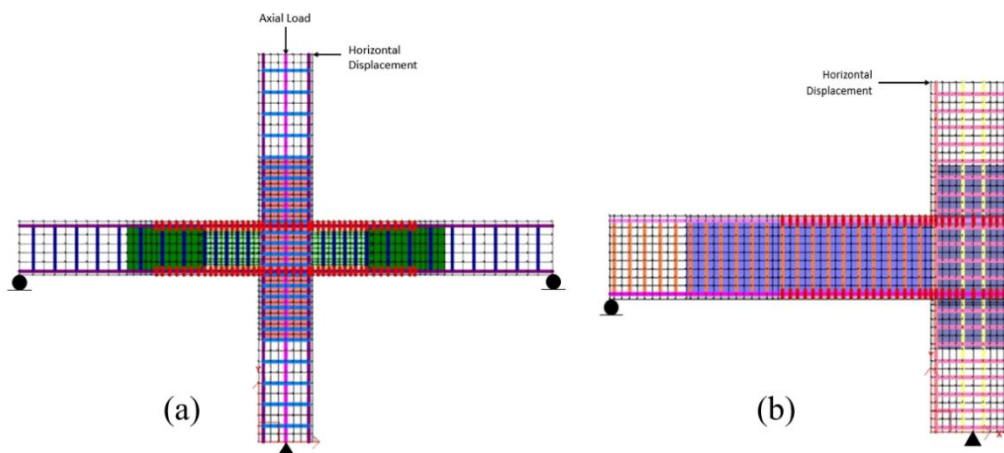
Typical VecTor2 modeling for (a) interior and (b) exterior beam-column joint specimens
